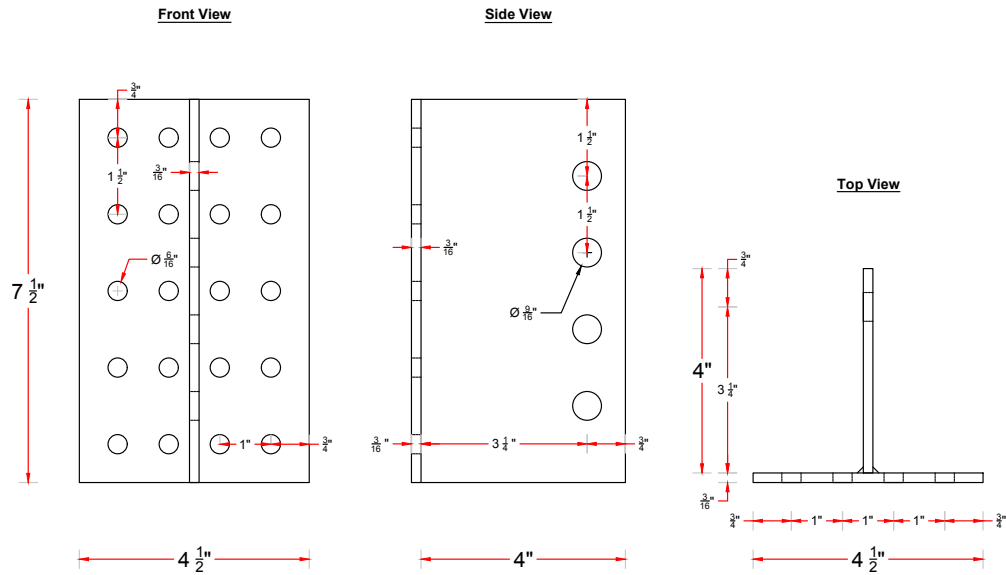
Geometry of T-shape welded steel connection
